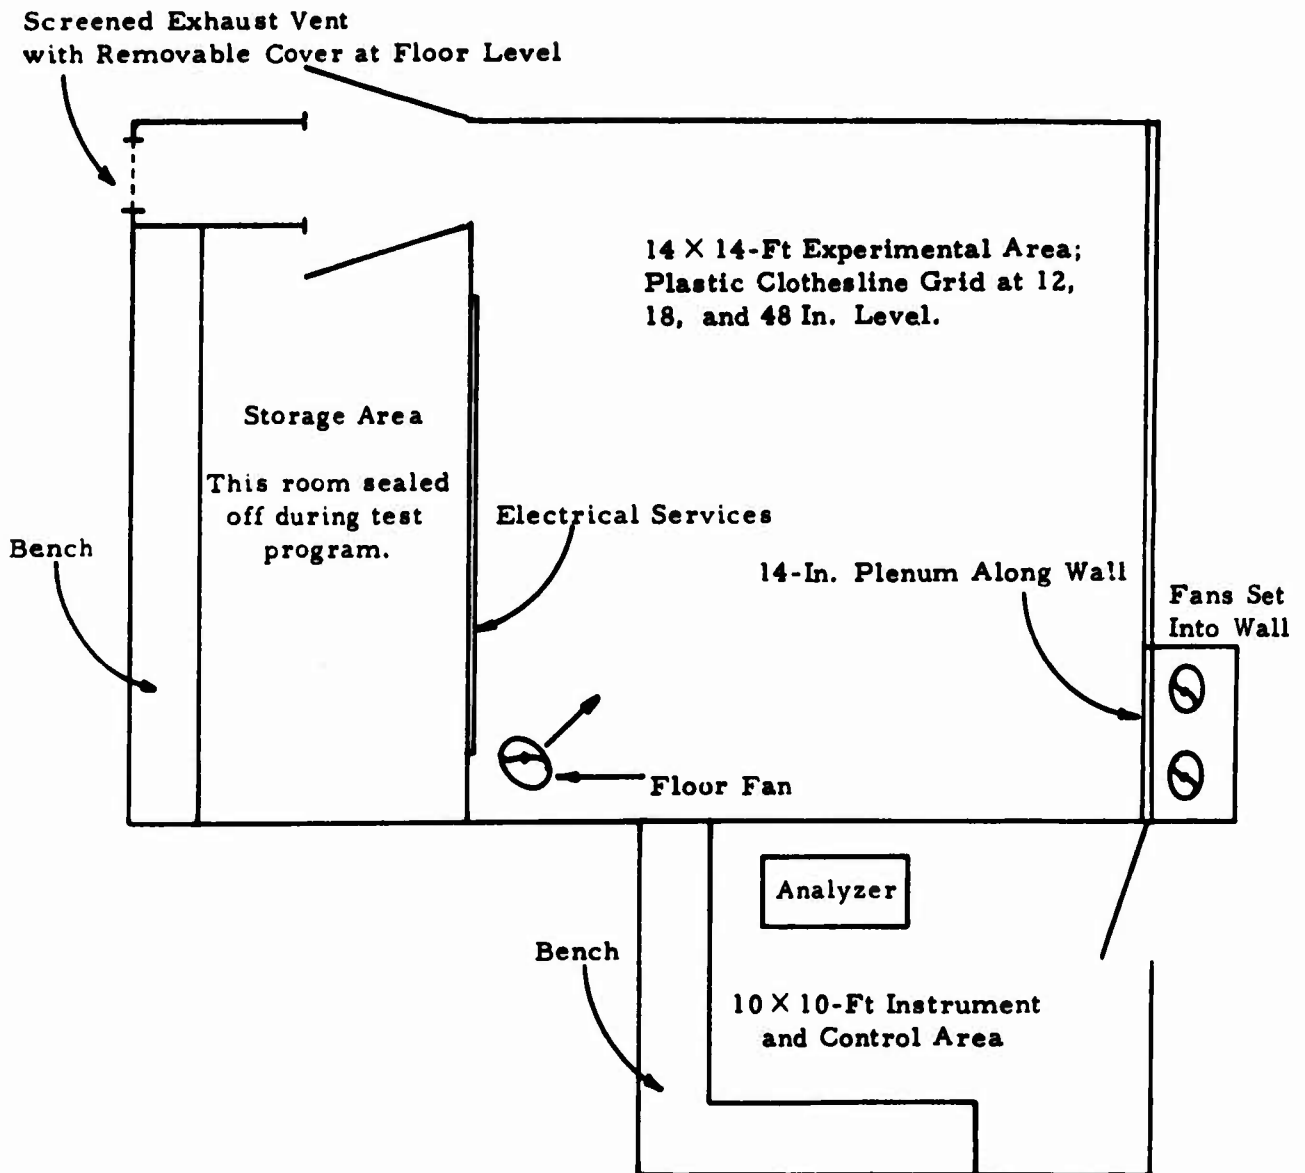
FLOOR PLAN-SIMULATED HANGAR SPACE
